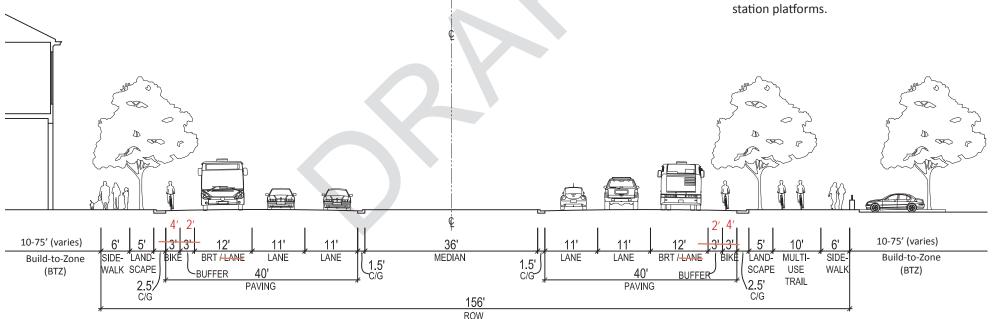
Street Type 6: Unser Boulevard Cross Section
